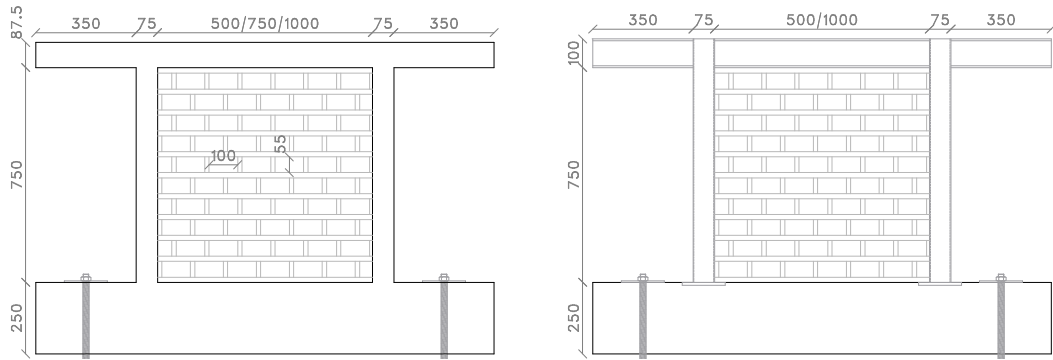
General geometric characteristics of the masonry infilled concrete and steel frame specimens.
